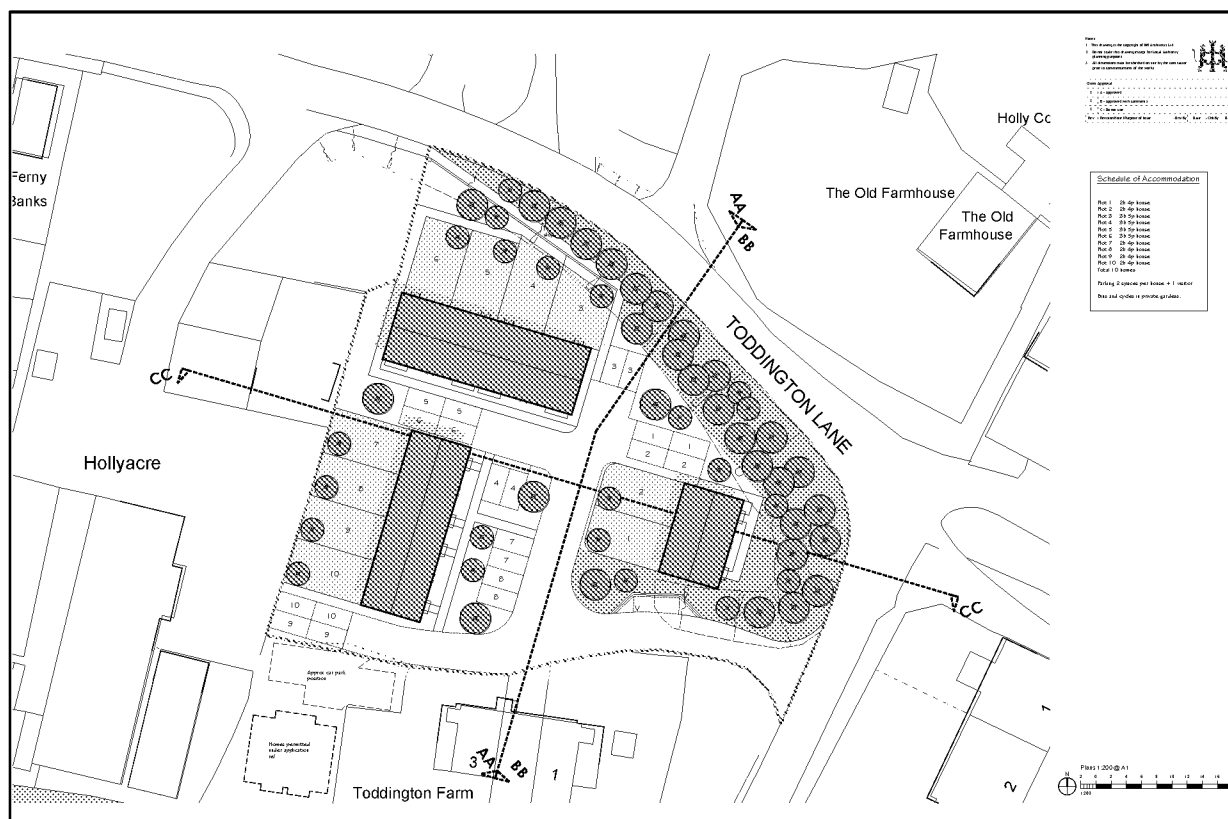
The proposed development layout plan for ten new dwellings at Land at Toddlington Lane. Plan courtesy of MH Architects dated 27th January 2022 (drawing no. 21-097-LTL-MHA-00-DR-A-SK01-P02).
